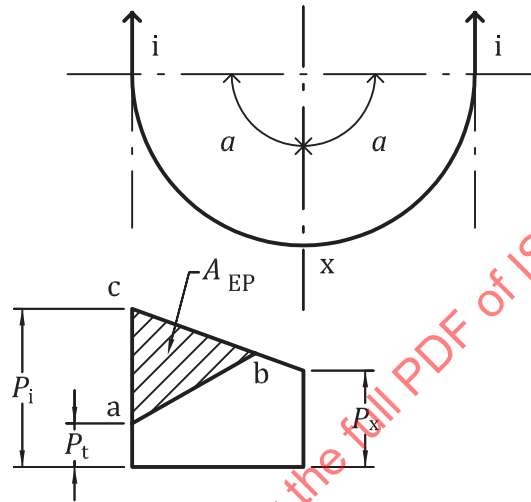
Tensile force loss of prestressing steel due to setting (a)
